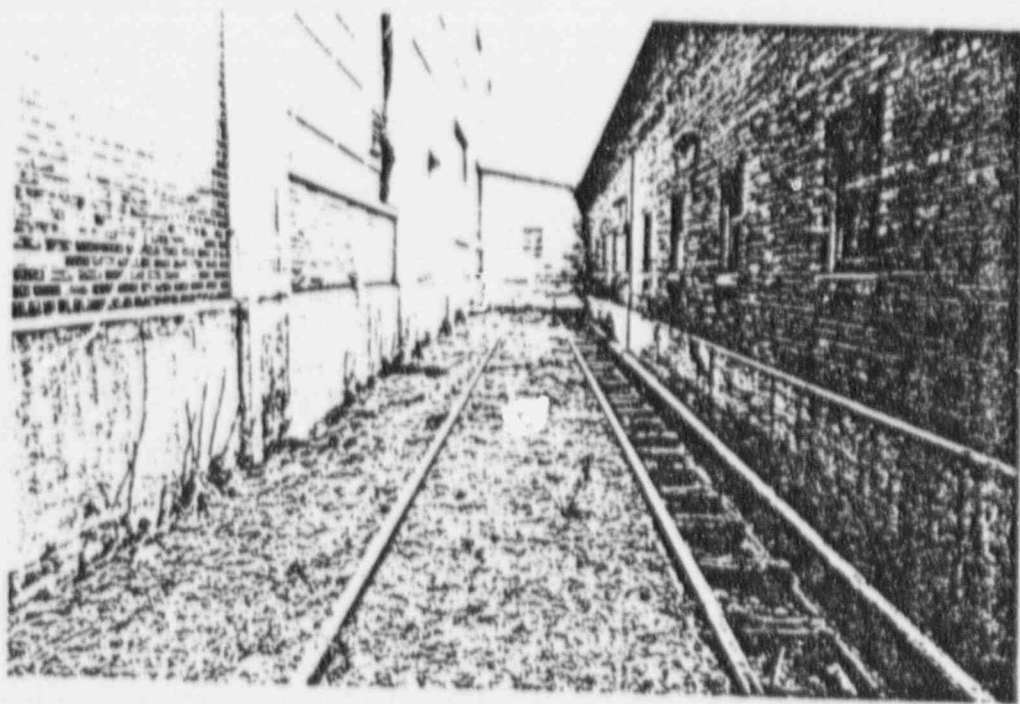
Location CA00318 looking north between buildings #38 and #20.
